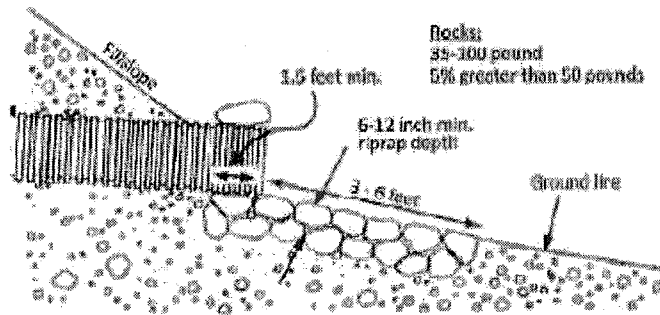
A. Riprap armor at culvert outlet (Modified from Keller et al., 2011).
